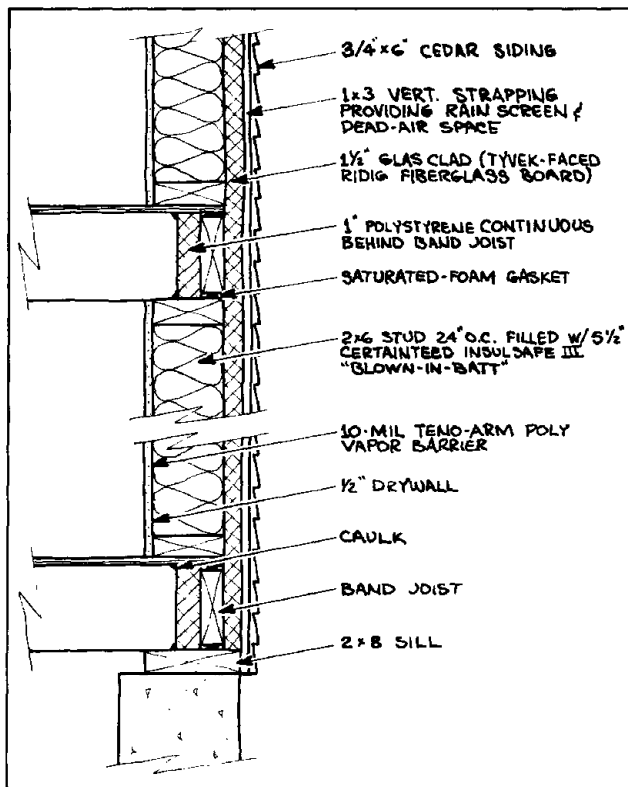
Doug George, of Salisbury, Conn., solves the problem of between-floor transitions by running a continuous strip of rigid foam against the inside of the band joists. Floor joists are cut short by 1 inch, but still have 3 inches of bearing.
